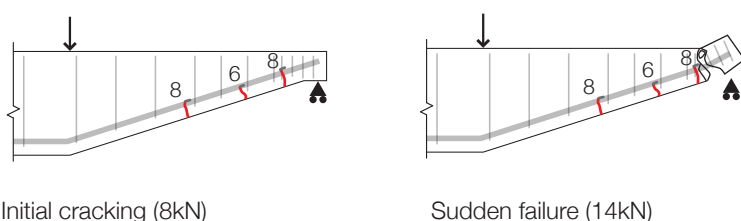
Crack progression and failure, Beam 9\_2\_EC2\_M.
